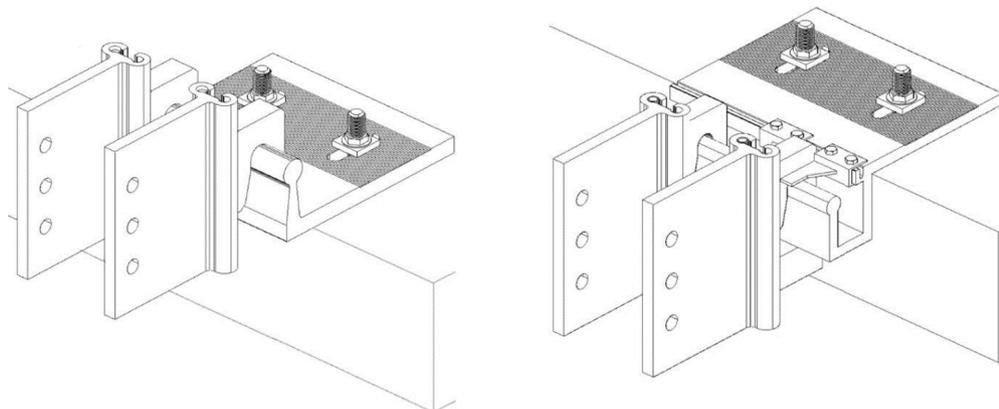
Two different bracket configurations for the mullion-to-floor slab interconnection.
